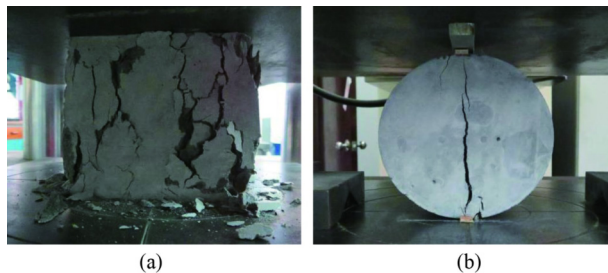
Concrete failure state: (a) compressive failure; (b) tensile failure.
